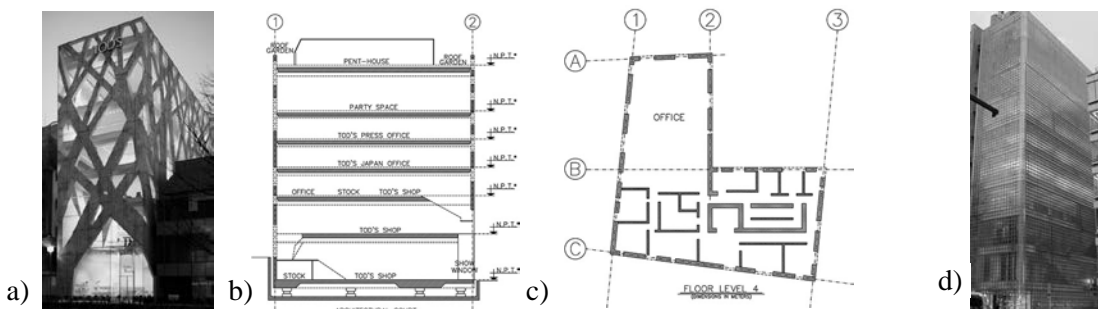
Tod's Building: a) Front view; b) Section; c) Floor plan and Maison Hermes d) Lateral View
